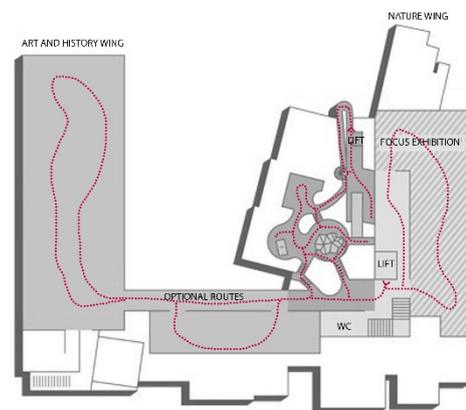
Lower Austria Museum in St. Pölten, Austria: Level +1. (Source: Floor plan by Niederösterreich Museum Betriebs GmbH with Markings by Filová, 2021)
